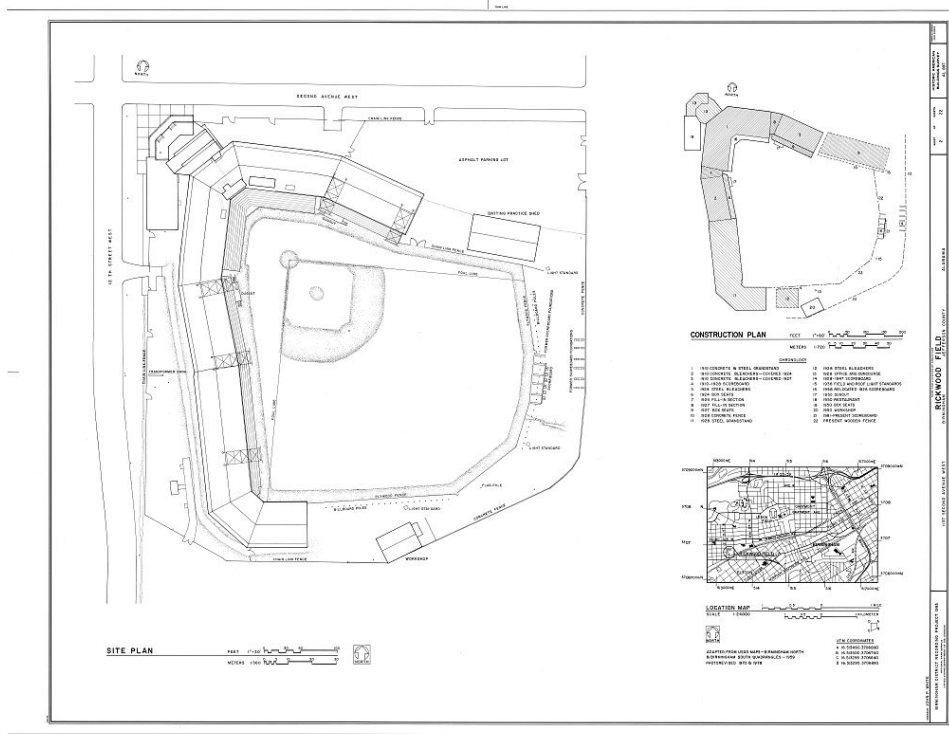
Site plan of Rickwood Field from HABS.²¹⁸
